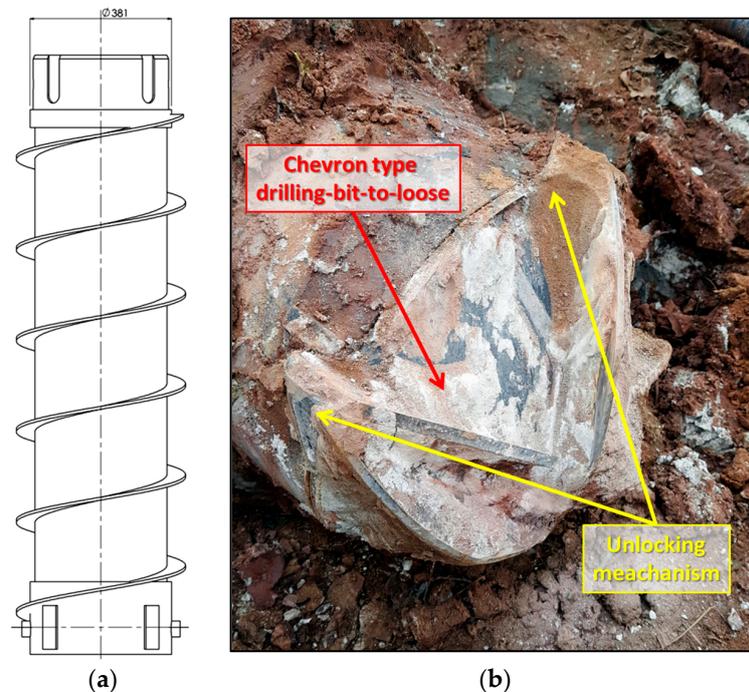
Enlarged easy drill technology (EEDT) tools: (a) casing segment with external spiral; (b) drag bit-to-loose for soft, clayey geological conditions.
